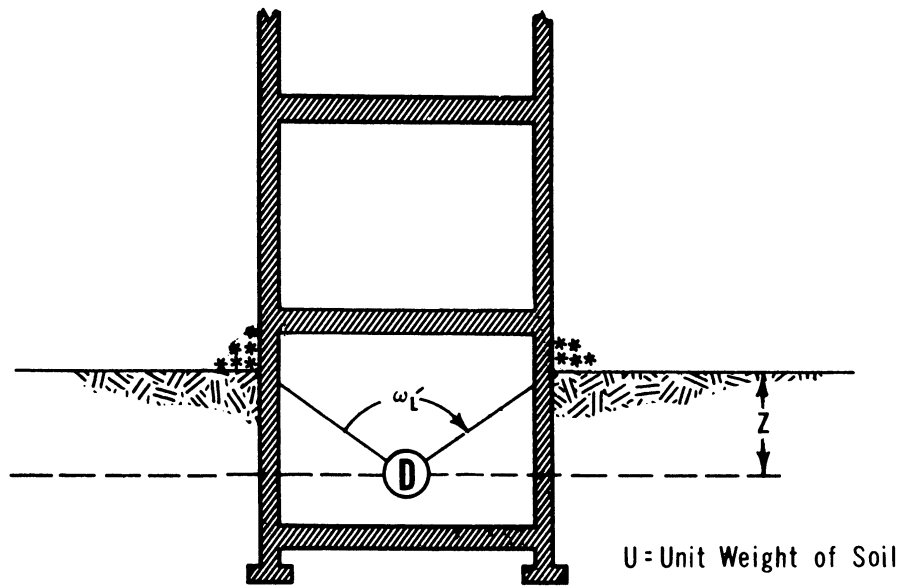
Fallout Particle Pile-Up on Foundation Walls.
